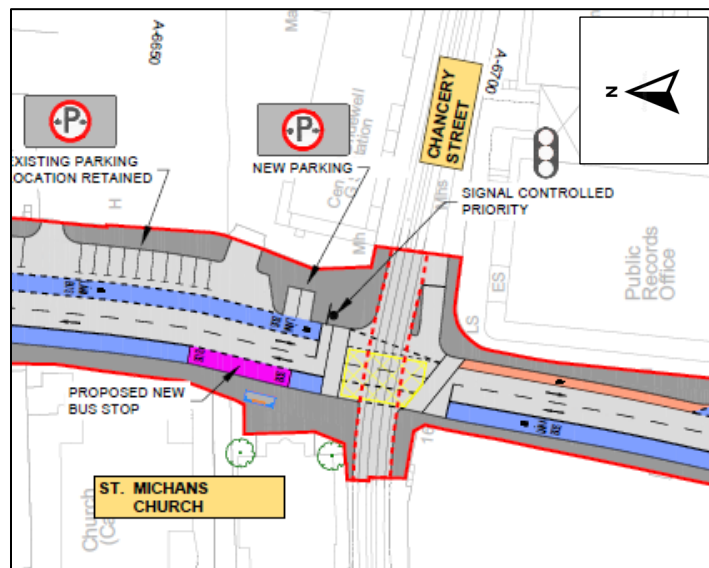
Extract from General Arrangement Drawing Sheet 18
